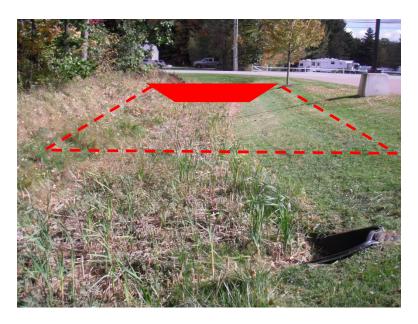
A bioretention basin could be located between the existing stormwater outfall and road side ditch.
